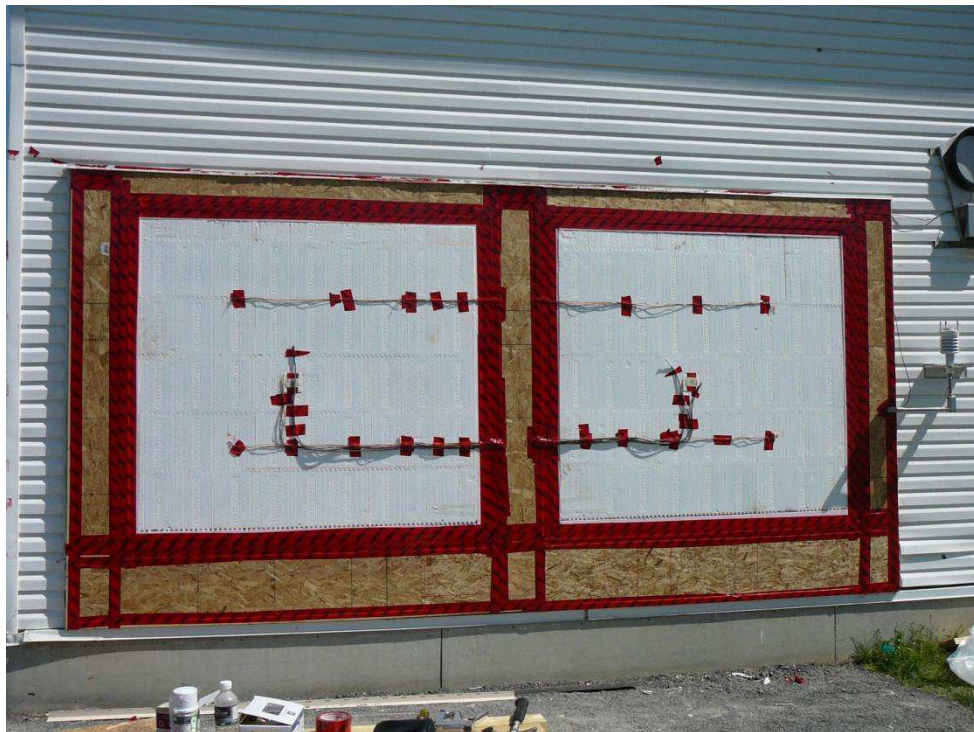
OSB sheathing board installed around the specimens, joints sealed with sheathing tape.
